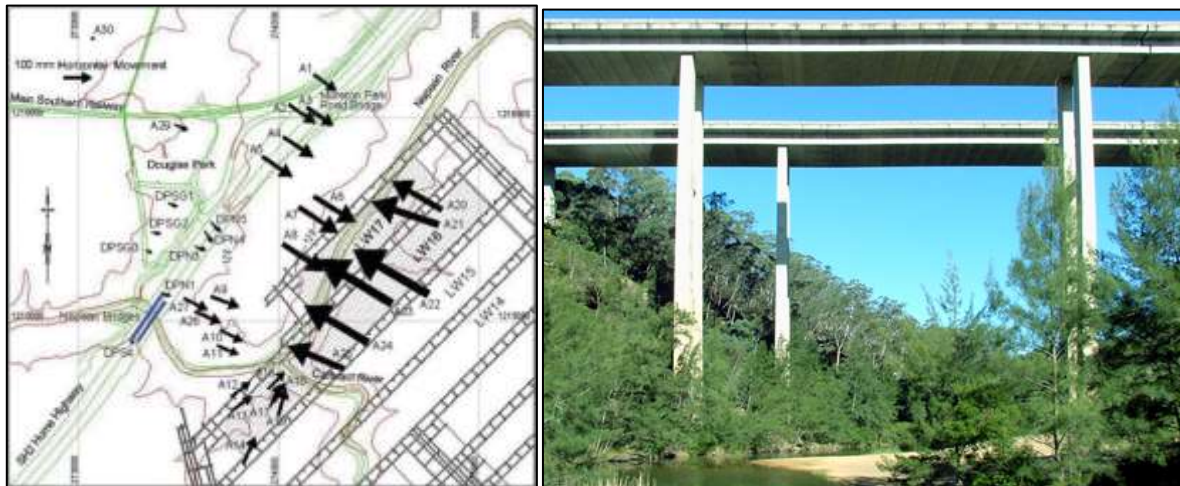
Tower horizontal movement from LW16 and LW17 and Nepean River bridge (Hebblewhite 2001)
